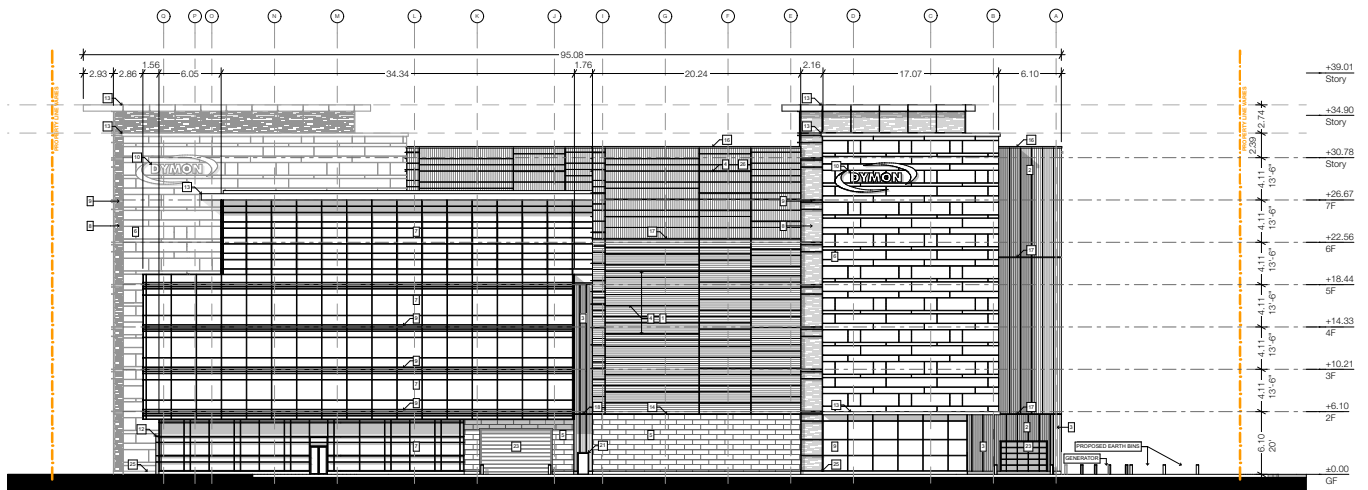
South Elevation of the proposed building by TACT Architecture Inc.
